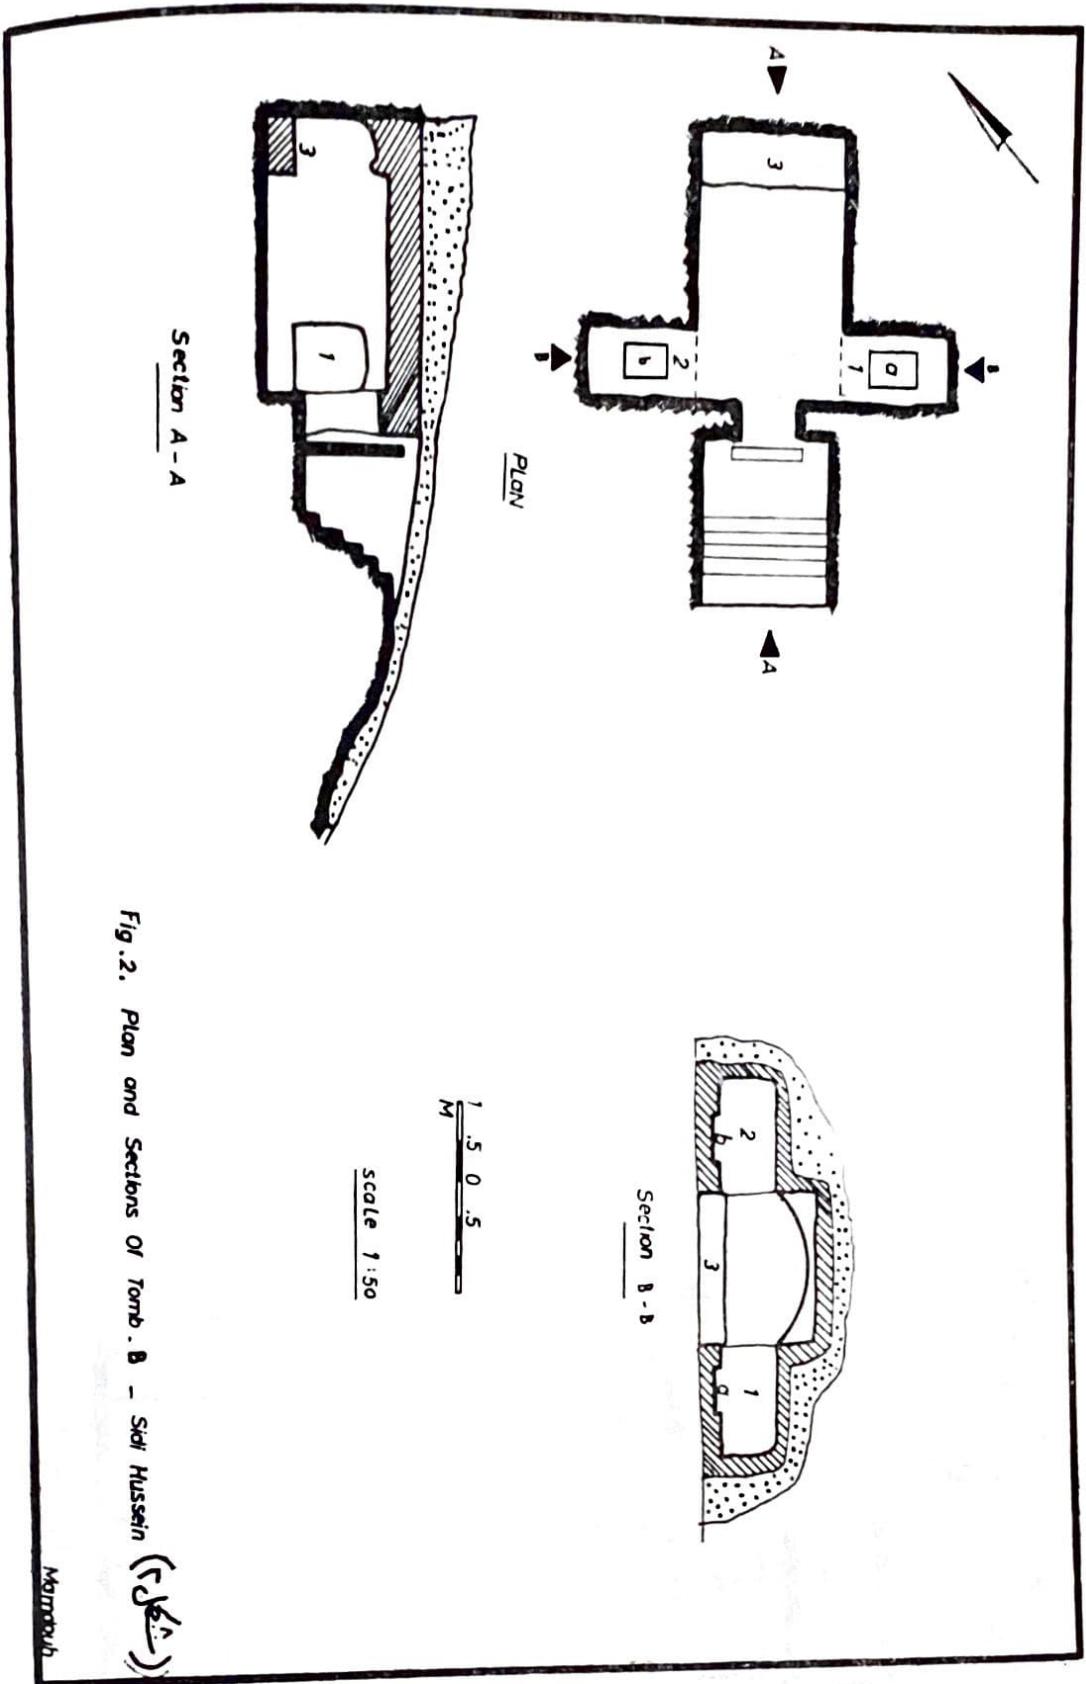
Plan and Sections Of Tomb .B - Sidi Hussein (سید حسین)
